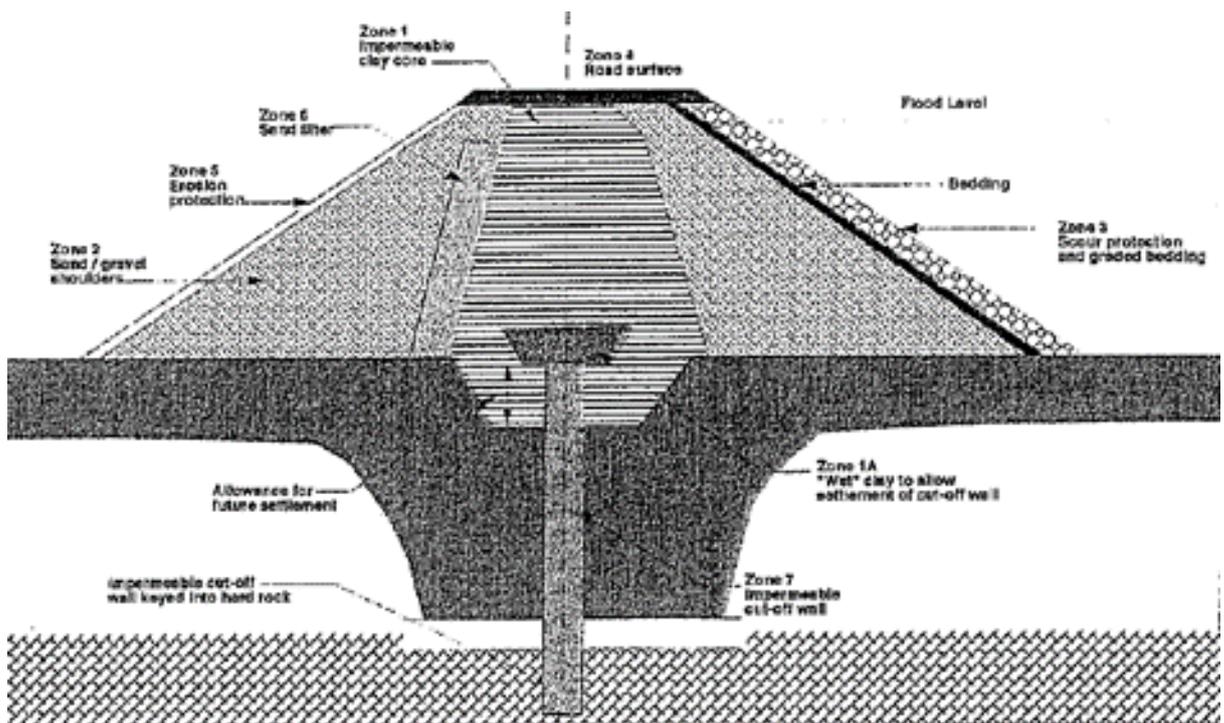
Cross section of the Levee and In-ground Barrier Wall
